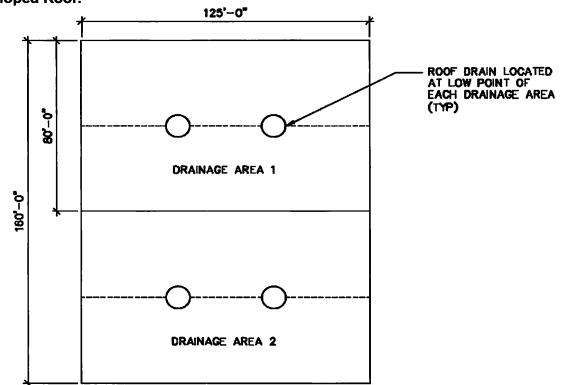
Plan View of Uni-Directionally Sloped Blue Roof
